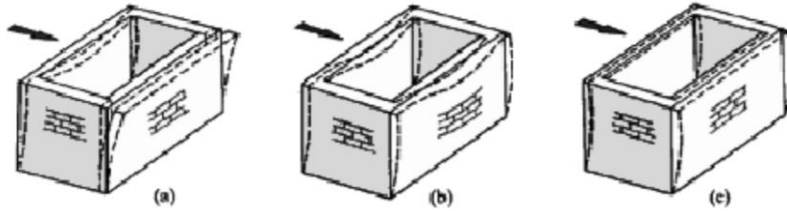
Behaviour of masonry buildings: (a) structural walls not tied together, (b) building with deformable floors and tied walls, (c) building with rigid floors and tied walls (Tomazevic, 2000)[14]
